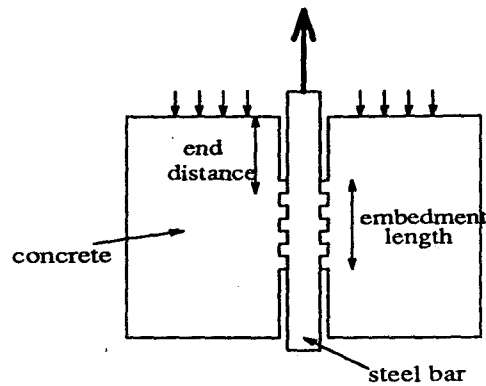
Typical Pull-Out Specimen with a Short Embedment Length.
